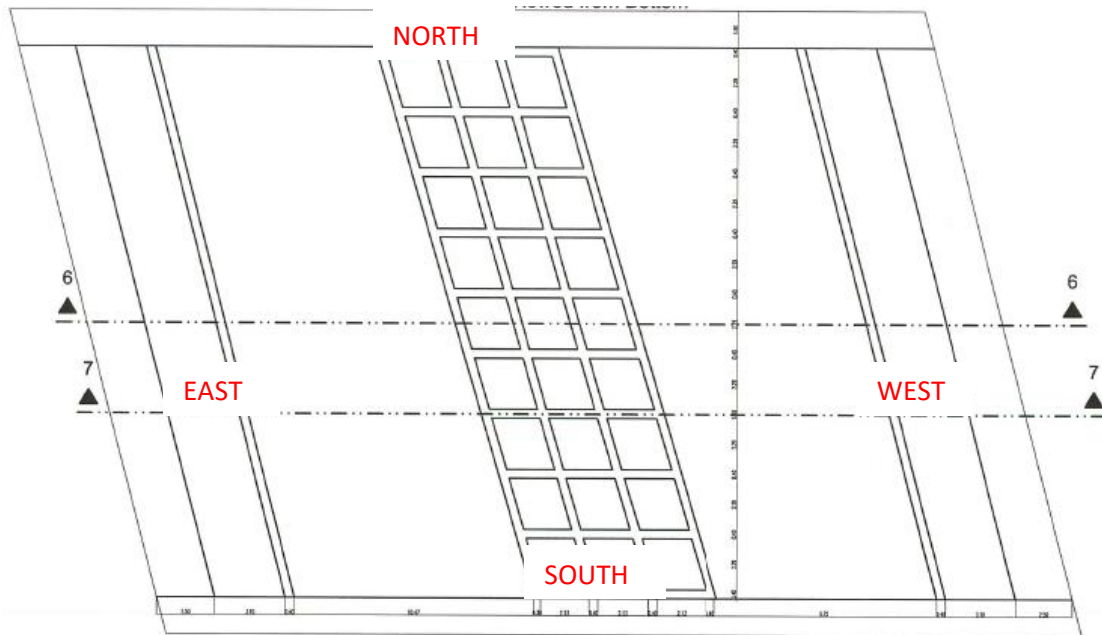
Arch slab view from bottom side and location of cantilever arch slabs
